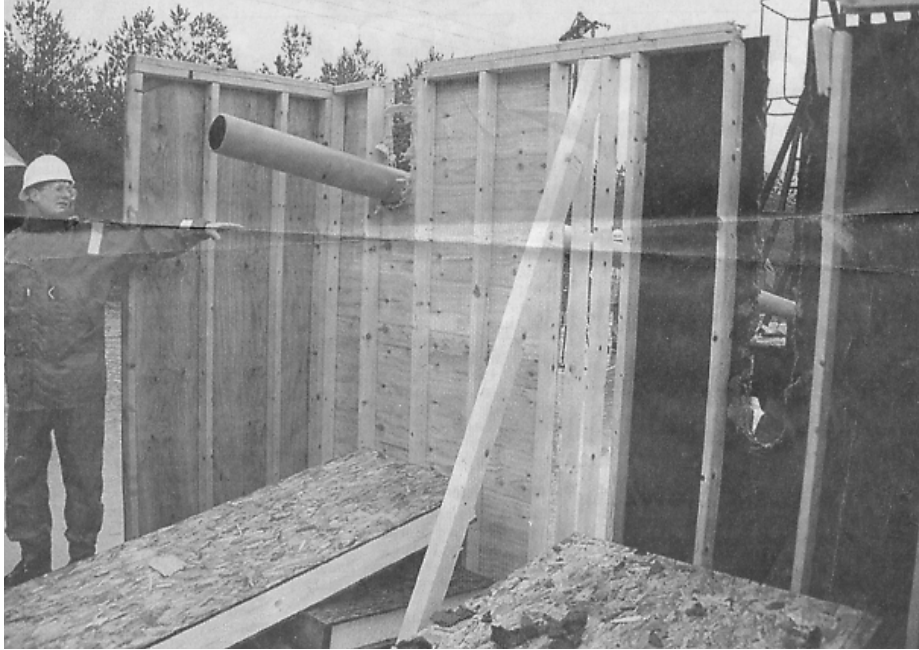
Small Pipe Impacting Wall with Plywood Sheathing, 3600 lb-ft at Impact, Breaking Top Plates and 1/4 Cutting Into Wall.
